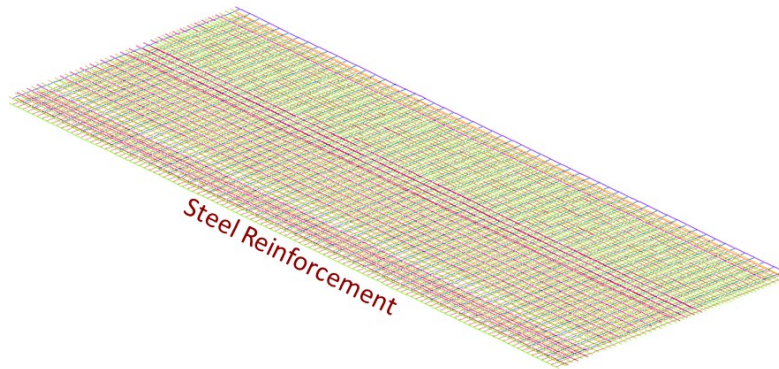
(c) 1D truss element reinforcing steel model embedded in concrete deck slab
